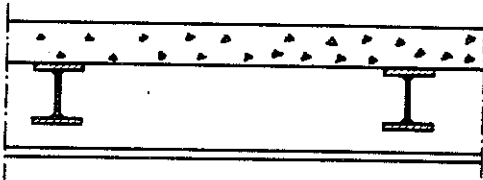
a. Steel girder floor construction with insulation in the form of a suspended ceiling
